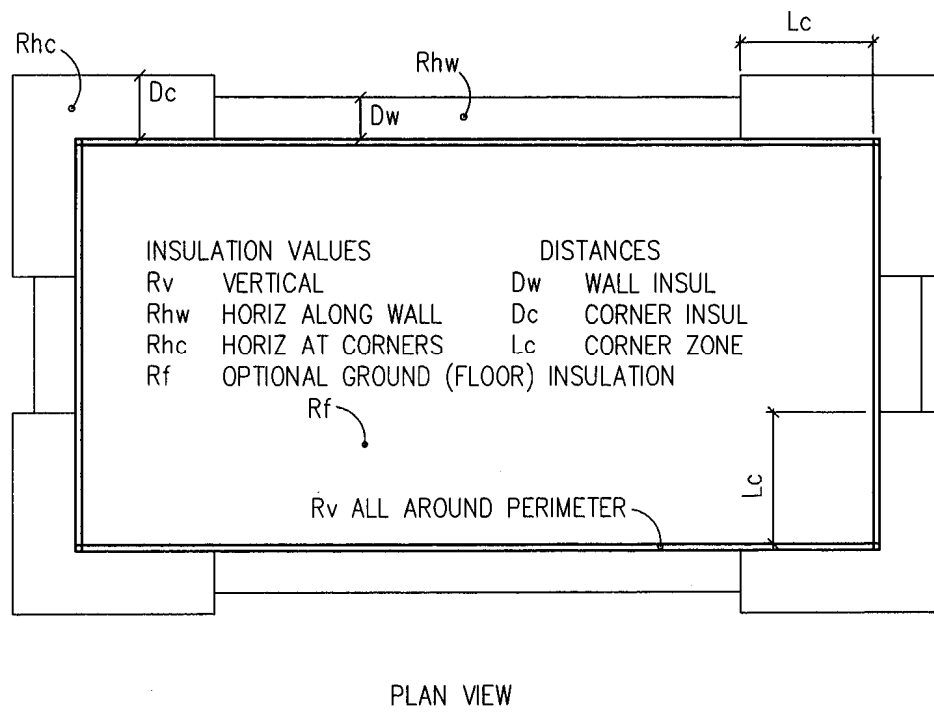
A plan view sketch showing a frost-protected shallow foundation. This sketch shows a bird's eye view, looking from far above a simple rectangular building. The sketch shows symbols, nomenclature, and distances used for installing insulation. Note the corner zone lengths (L_c) requiring extra thermal value and extents for insulation.
